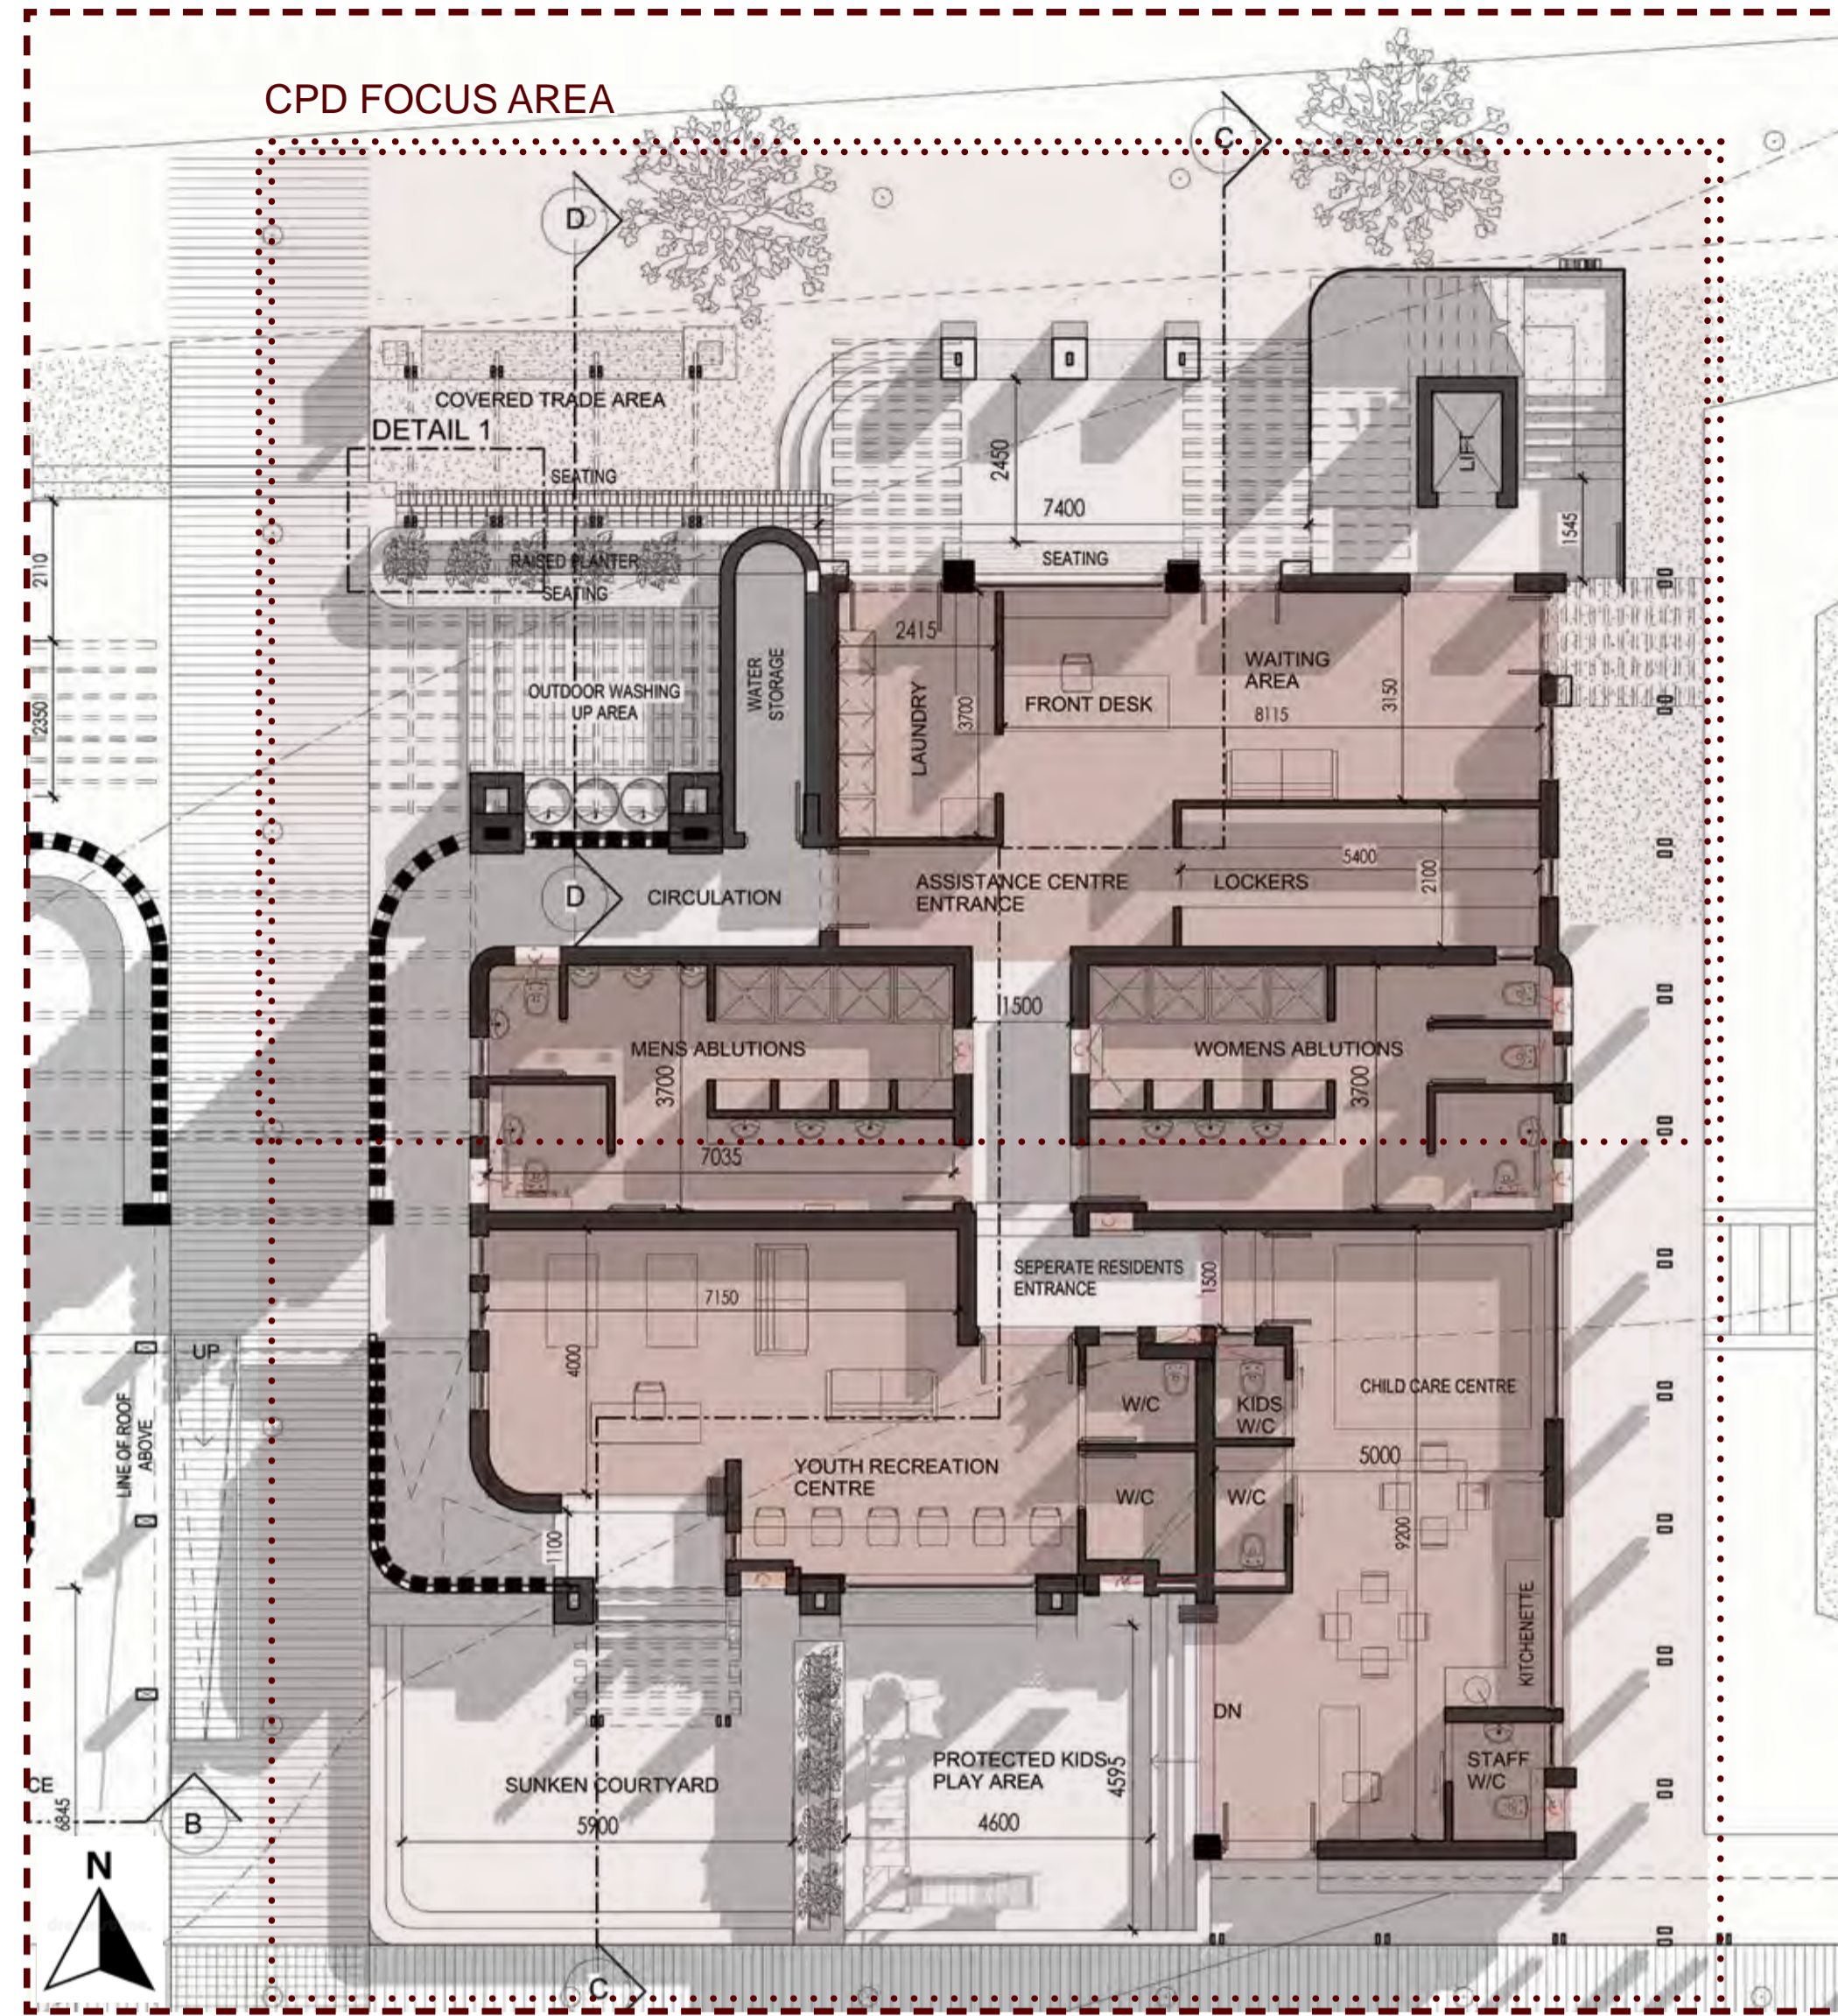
FINAL ITERATION OF THE GROUND FLOOR PLAN (AUTHOR, 2023)
